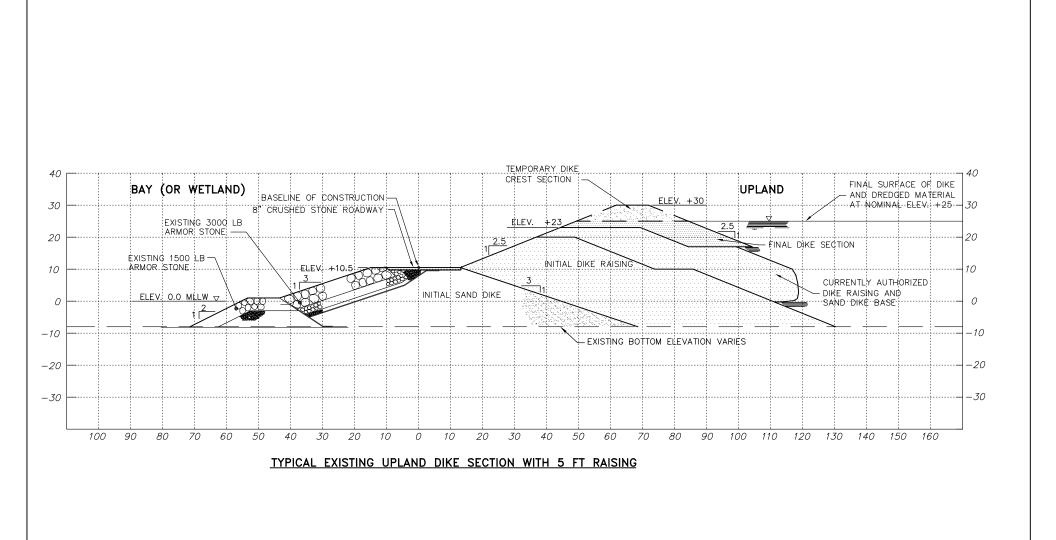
Typical 5 ft. Dike Raising Section for Existing Upland Cells 2 and 6
